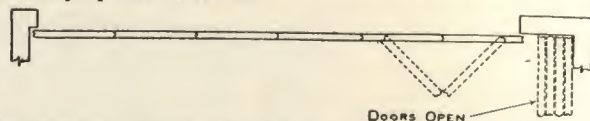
Showing how doors stand behind a projection of the wall. As the first door on the right end must slide to get into the door space behind projecting wall, rollers are substituted for the pivots otherwise used on this door. Spring jambs are not necessary.
